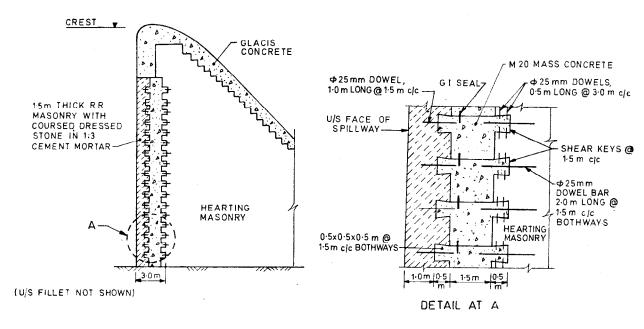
SANDWICH CONCRETE MEMBRANE ON UPSTREAM FACE
